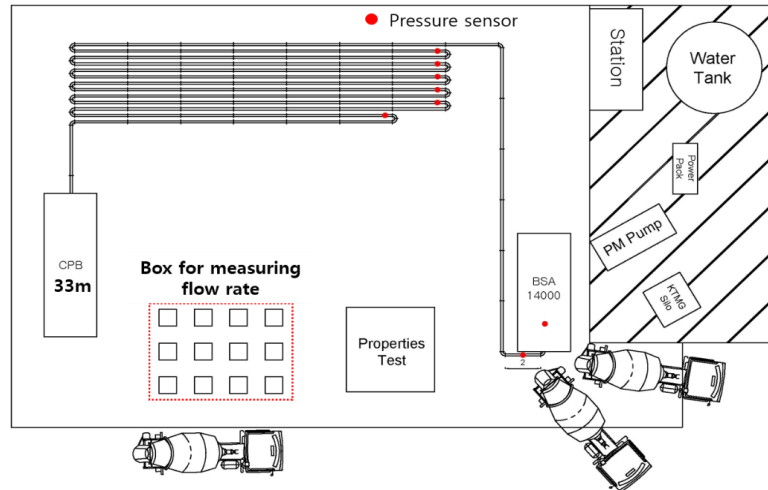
Layout of 337 m horizontal pipeline for pumping test
